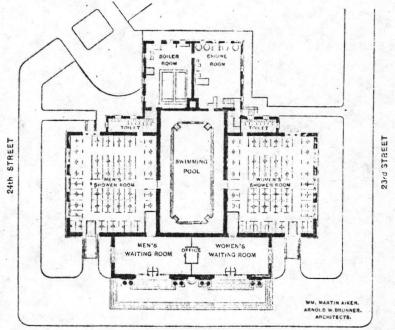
Plan of 23d Street People's Bath House, in New York City.
